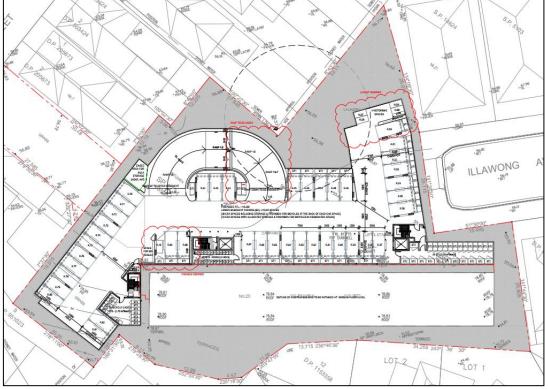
Extract of Proposed Lower Basement Parking (B2) Plan – 20 Illawong Avenue, Tamarama Source: Group GSA
